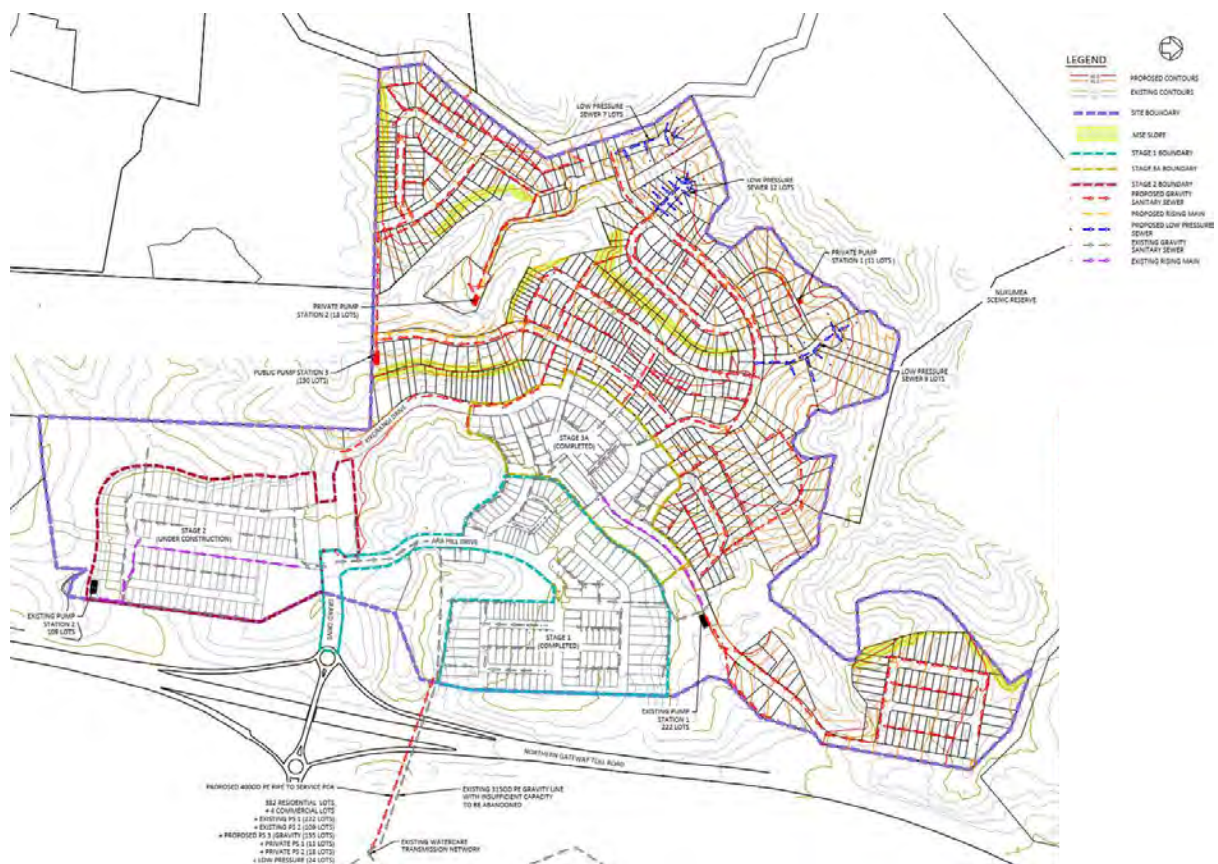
Proposed Indicative Wastewater Plan Option 1
